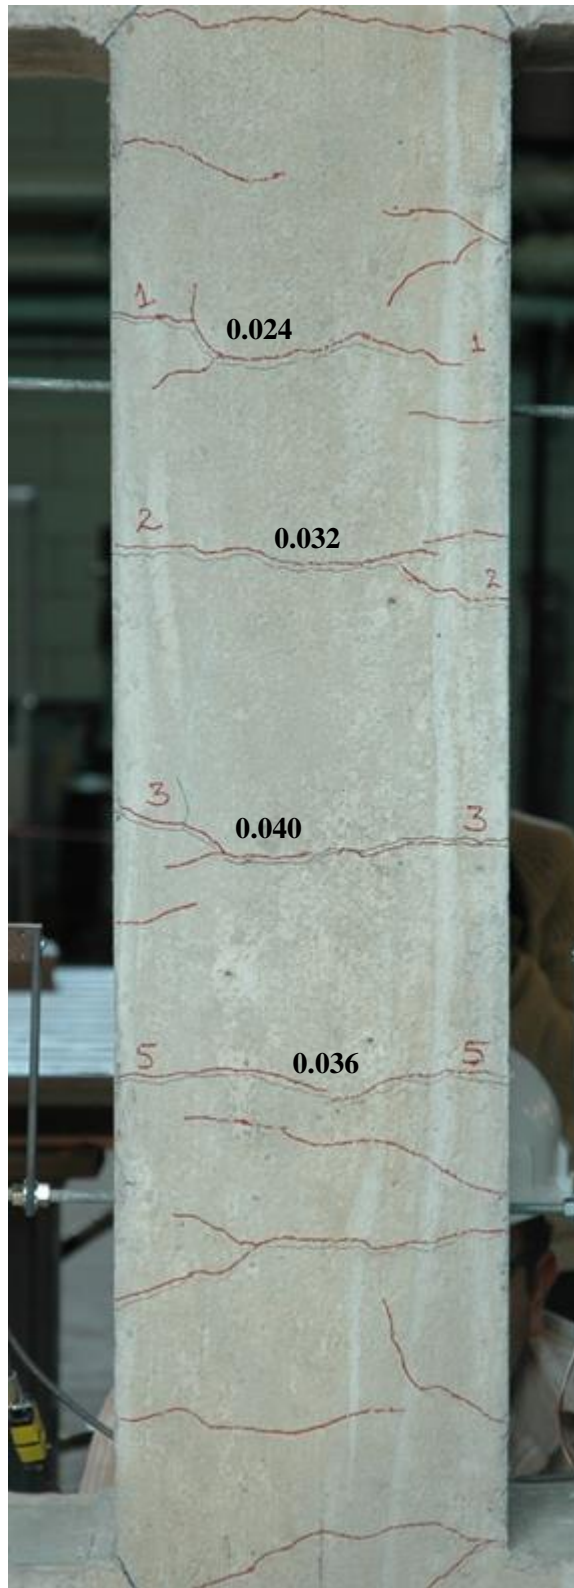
Cracks on west face of TS01 at Load Step 21
